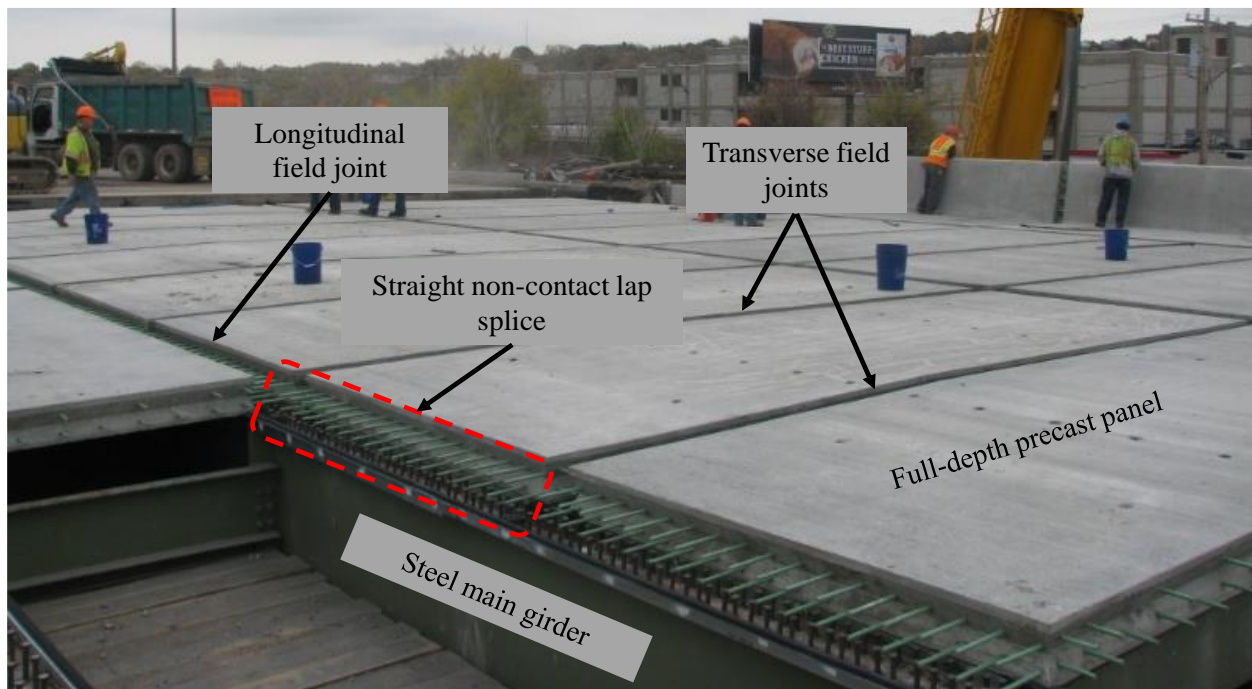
Types of field joints in a typical prefabricated bridge deck system.
